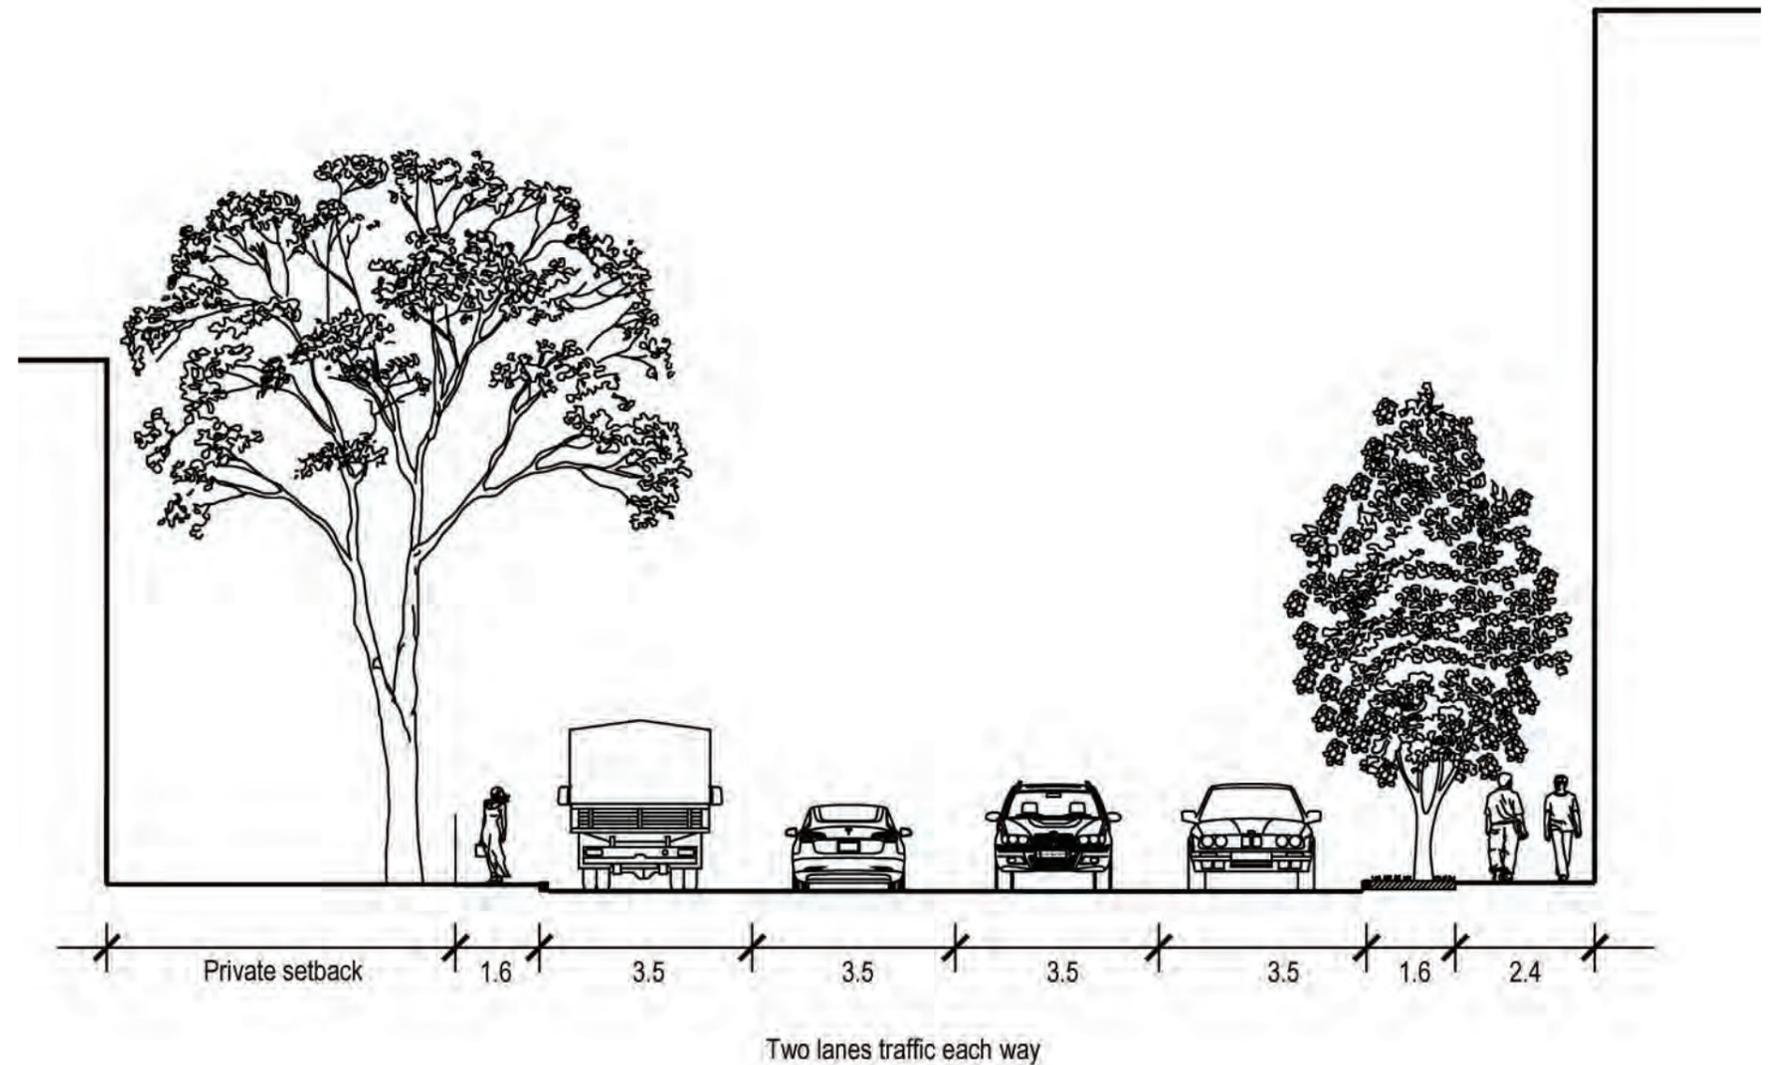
Pritchard Street Section at Mall Site - Looking West
